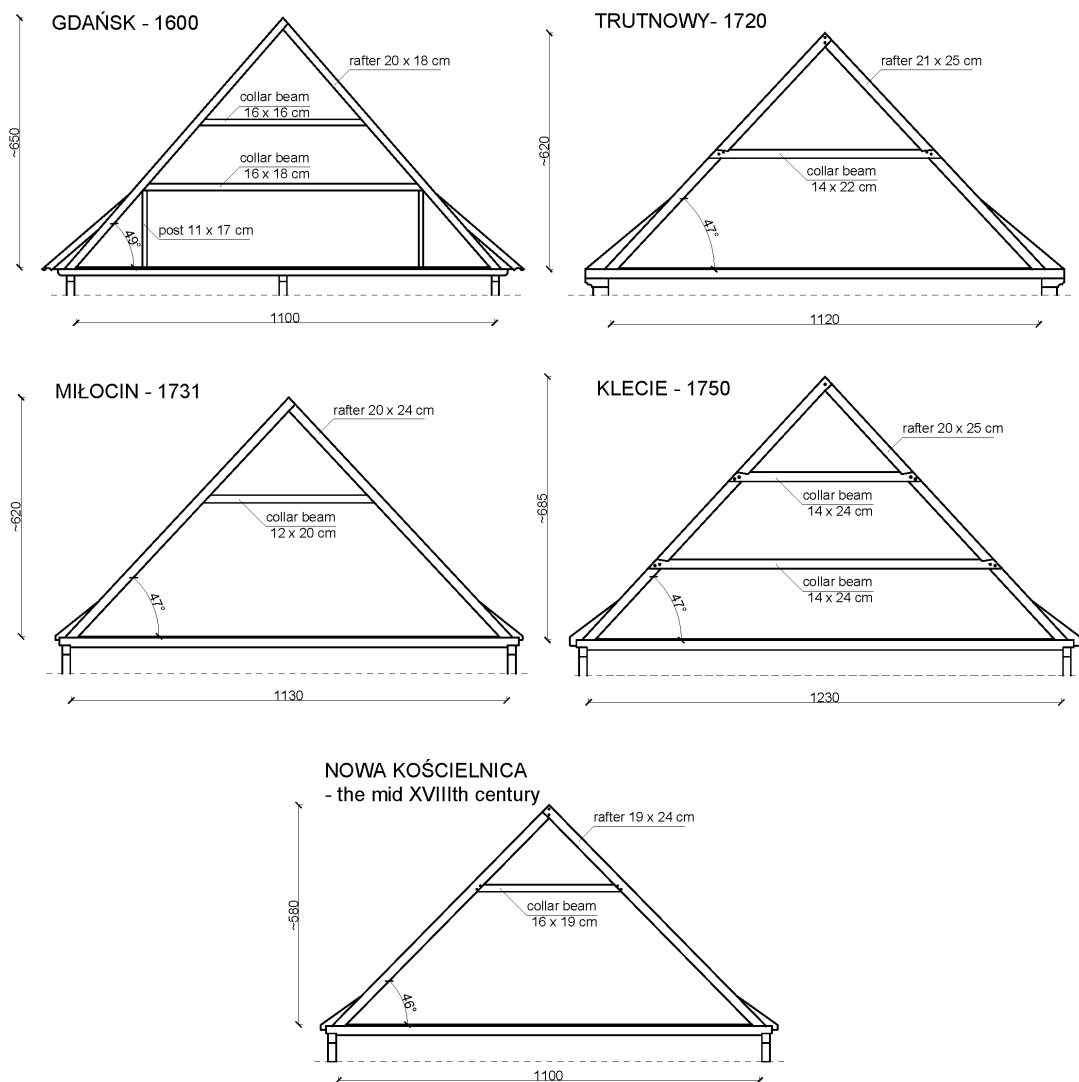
Timber roof truss schemes (Gdańsk, Trutnowy, Miłocin, Klecie, Nowa Kościelnica)
